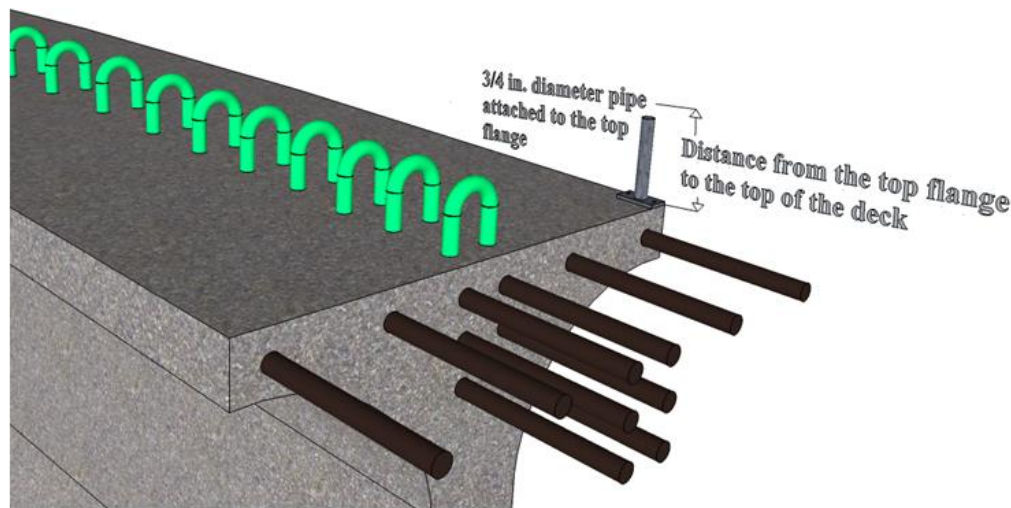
Details showing hollow steel pipes attached to the top flange of the PPCB
